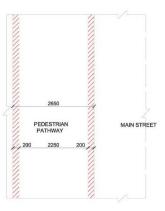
Street width and buffer spaces (in mm) for Gateway 13 in the area surrounding Offenbach am Main Hauptbahnhof
